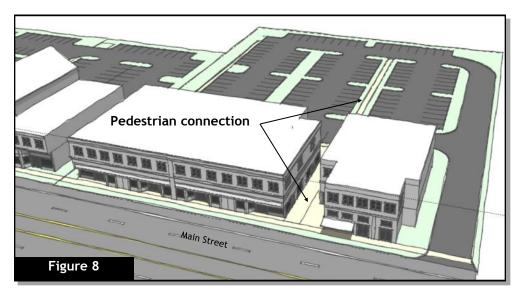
depicts a single, large property on which two structures are built, each sharing a parking area in the rear. This concept also provides a common pedestrian network and plaza space that connects each building entry with the common parking lot and the street.
